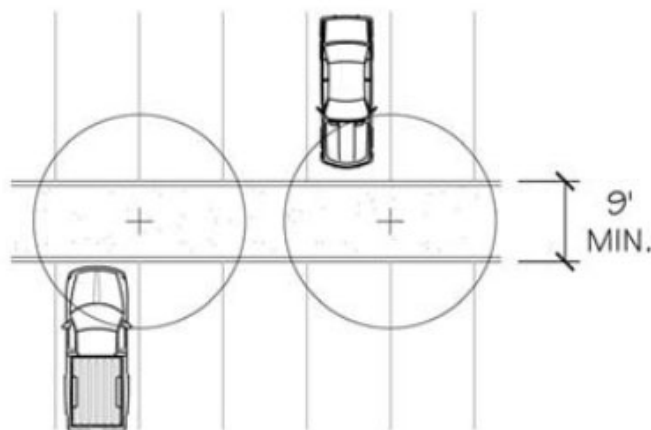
MINIMUM WIDTH OF LANDSCAPE ISLAND PERPENDICULAR TO SPACES (PARKING ON ONE SIDE)
